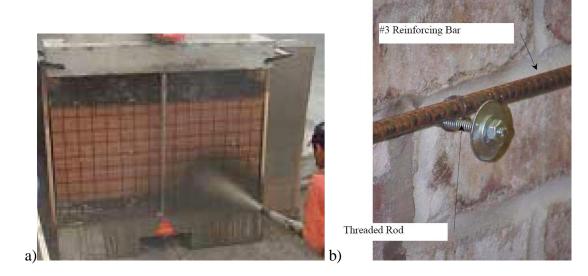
(a) Spraying shotcrete on masonry wall [5], (b) dowel to improve bonding [6]
